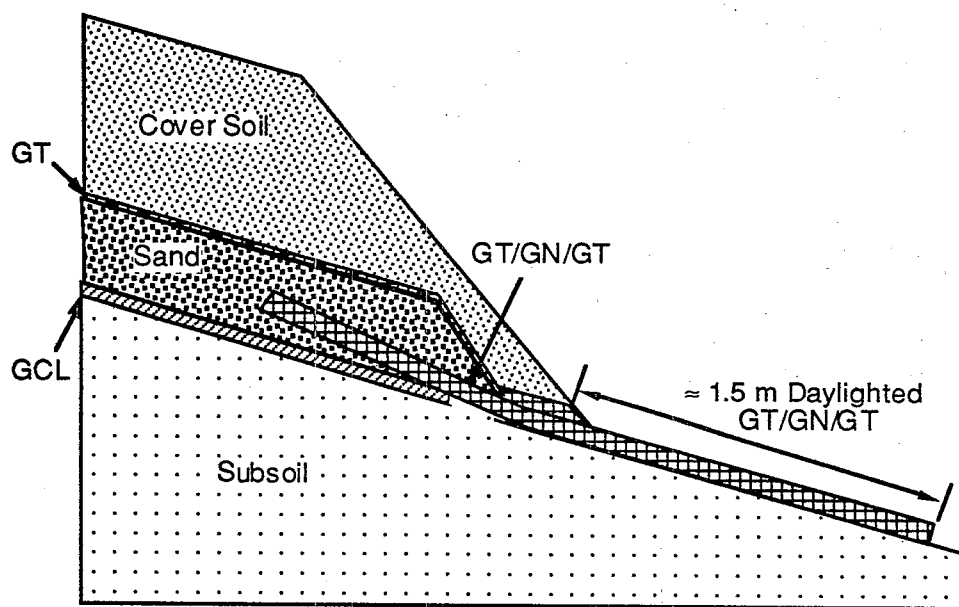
Detail of Drainage at Toe for Sections with Granular Drainage Material (Not to Scale).
